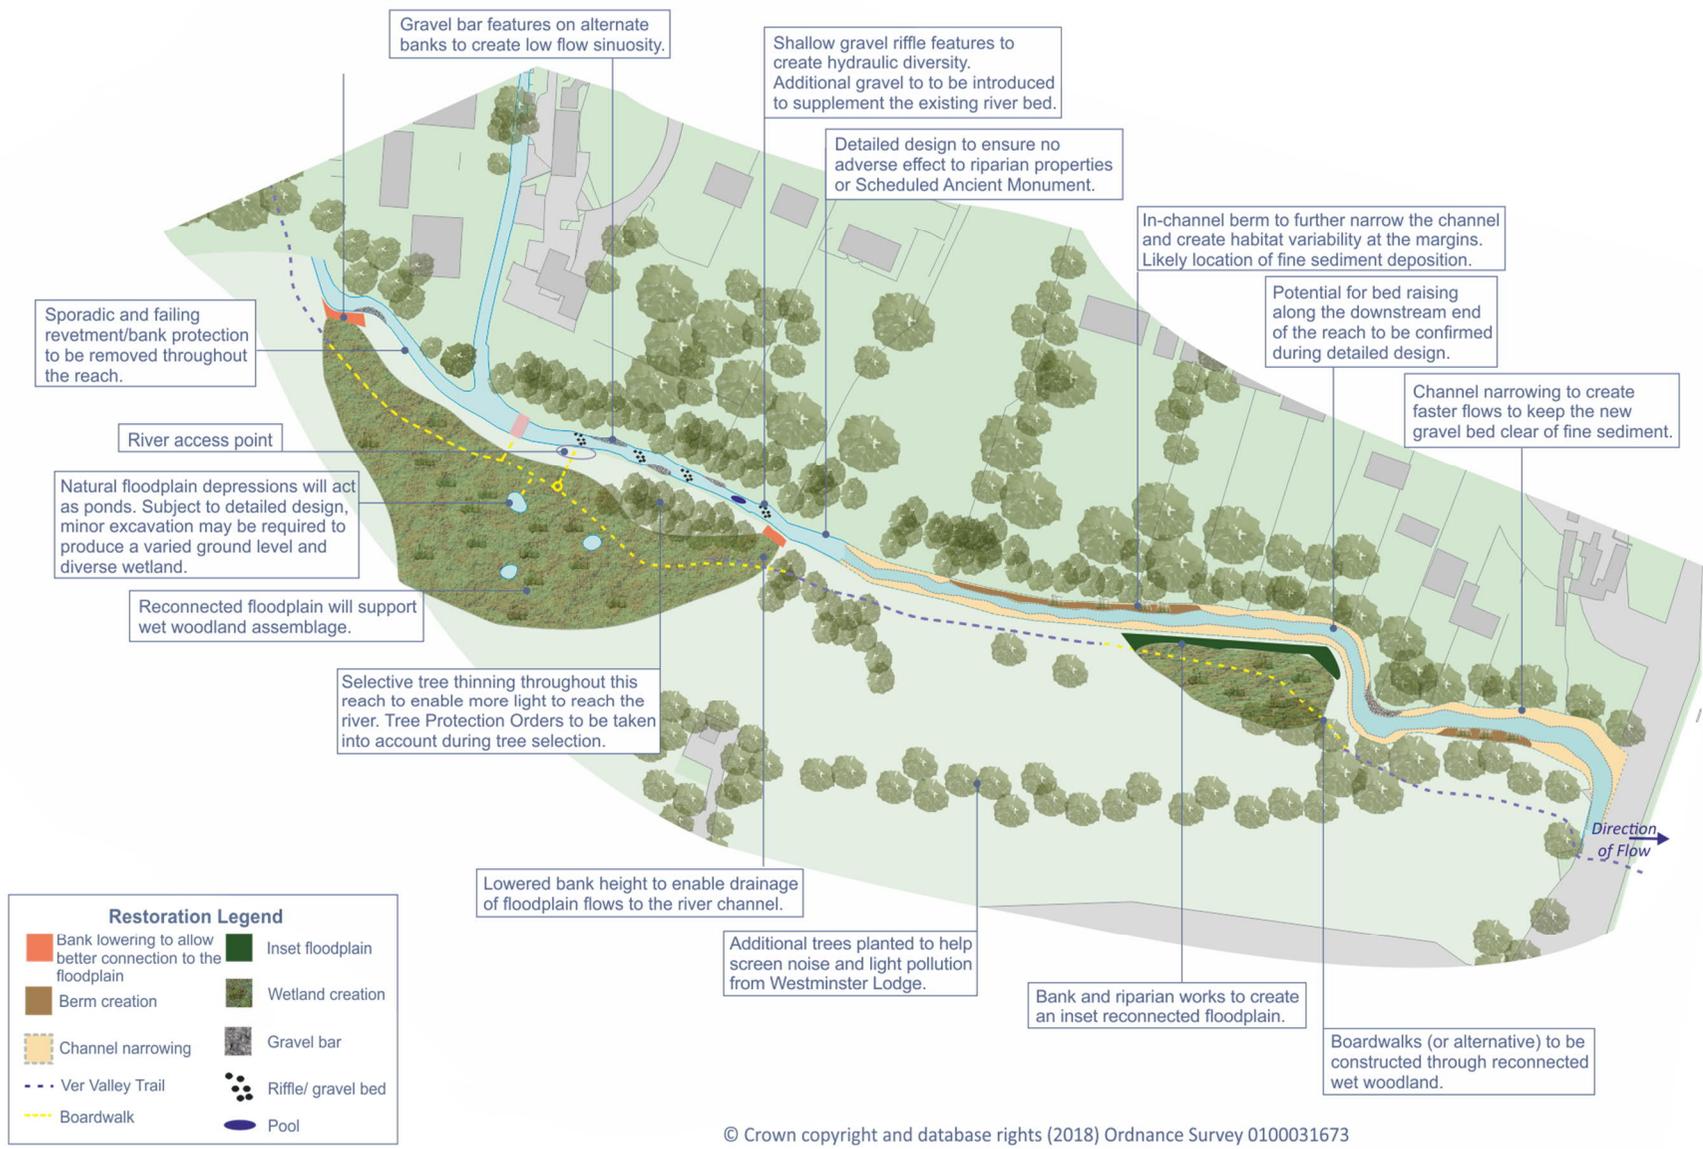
Reach 2 Final Outline Proposal Plan (post engagement)
